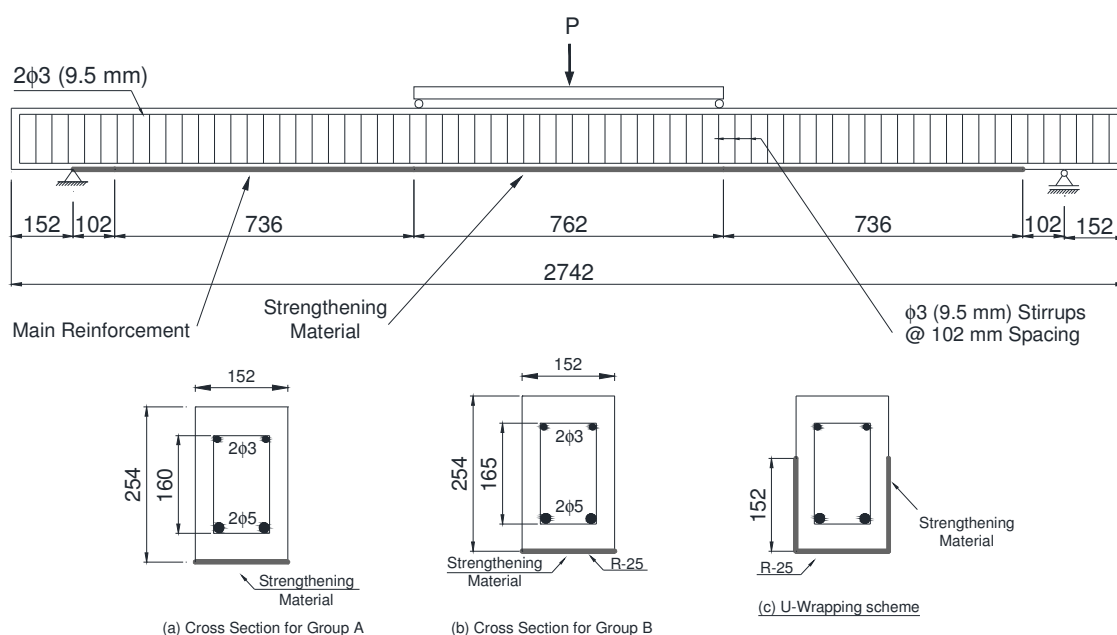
Details of test beams in Groups A and B (Grace et al., 2003; dimensions in mm).
